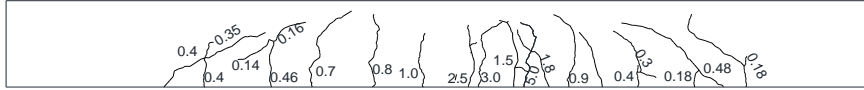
and 6.4 show the crack pattern including widths and numbers for all tested beams. Tables 6.2 and 6.3 also present the maximum crack width of each tested beam at service and failure load. In this study, 40% of the estimated failure load was taken as a customary service load level, which is in agreement with the assumption given by Gholamreza et al. (2009). From the results, it can be observed that increasing the percentage of CR generally showed a reduction in the maximum crack width of tested beams at both service and failure load. For example, increasing the percentage of CR from 0% to 15% (beams with comparable ultimate deflection) reduced the maximum crack width from 5 to 3 mm in B1/1-B4/1 and from 3.5 to 2.5 mm in B1/2-B3/2. Such results may be attributed to decaying the tensile strength of concrete as the CR increased, which may allow for developing larger number of visual and tiny cracks instead of continuous widening of one localized crack, thus reducing the overall cracks' widths. By looking at VRC compared to SCRC beams (B7/2 compared to B4/2), it can be seen that the type of concrete did not have a significant effect on the cracking behaviour of beams (see Figure 6.4 and Table 6.3).
